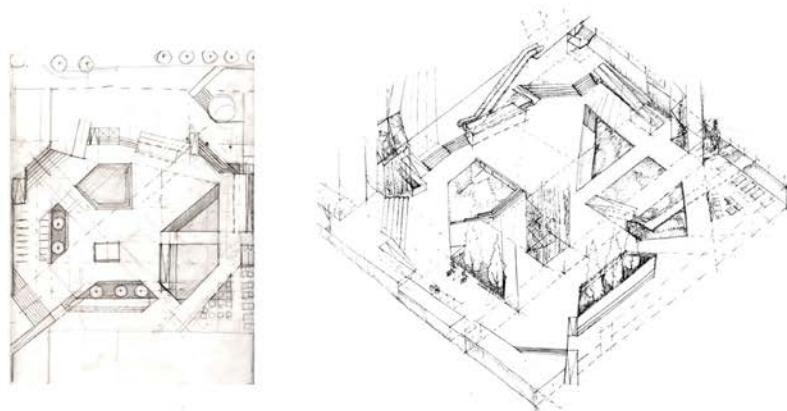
Ground floor iteration on plan and in isometric (Author 2016)
